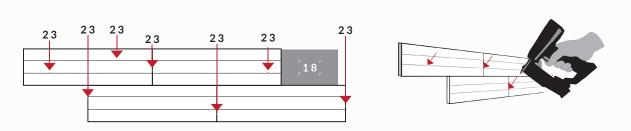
FIG. A: ABOVE EYE LEVEL, USE #23 GAUGE NAILS AT A DOWNWARD ANGLE.
